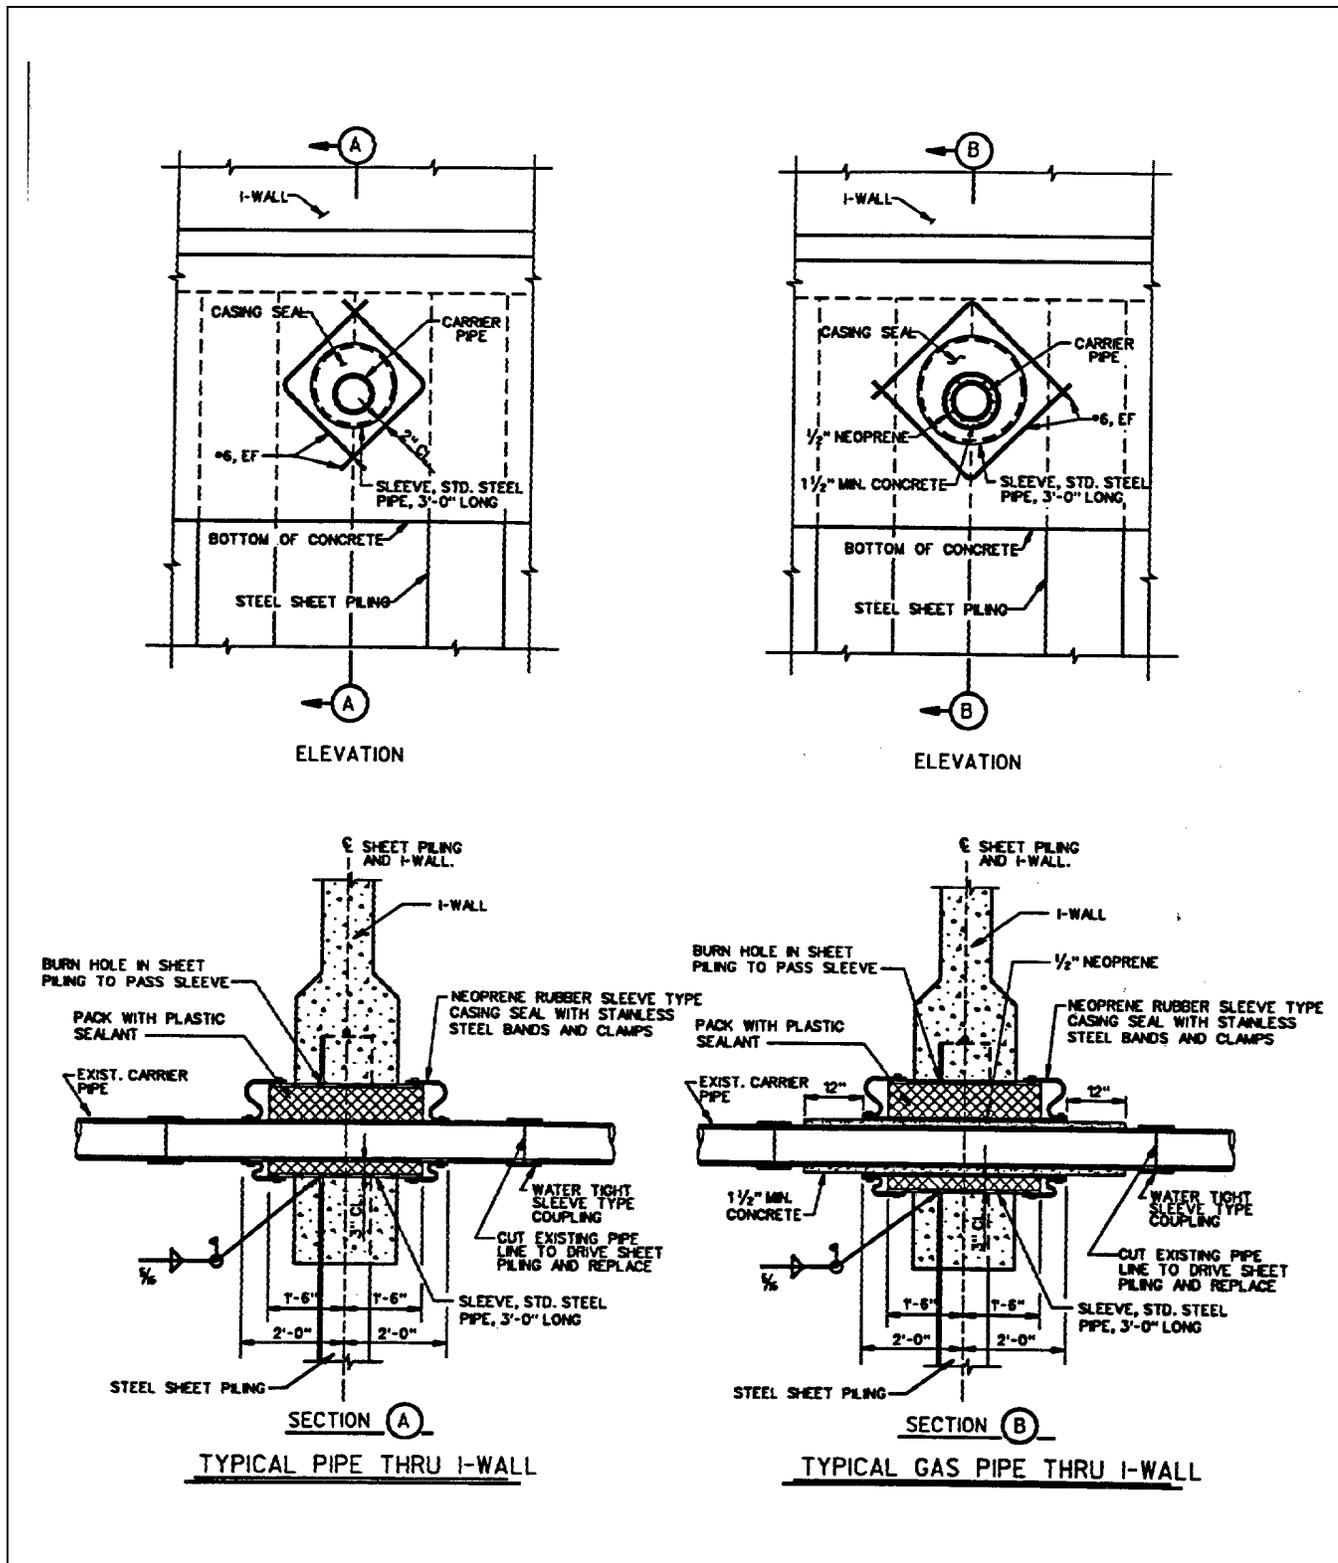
Typical utility crossings (Sheet 1 of 4)
